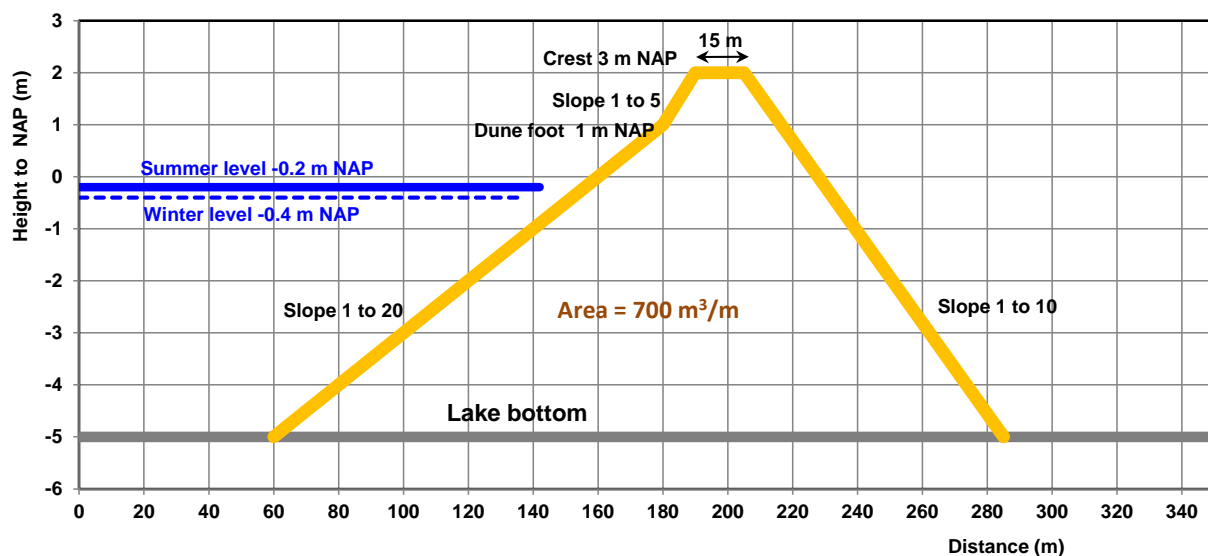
Cross-section NW-beach; slope 1 to 20
